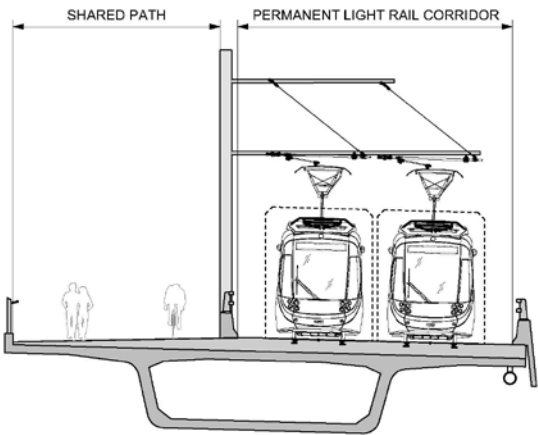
Typical cross section - New bridge between Melrose Park and Wentworth Point at mid-span (indicative only - subject to design development).
